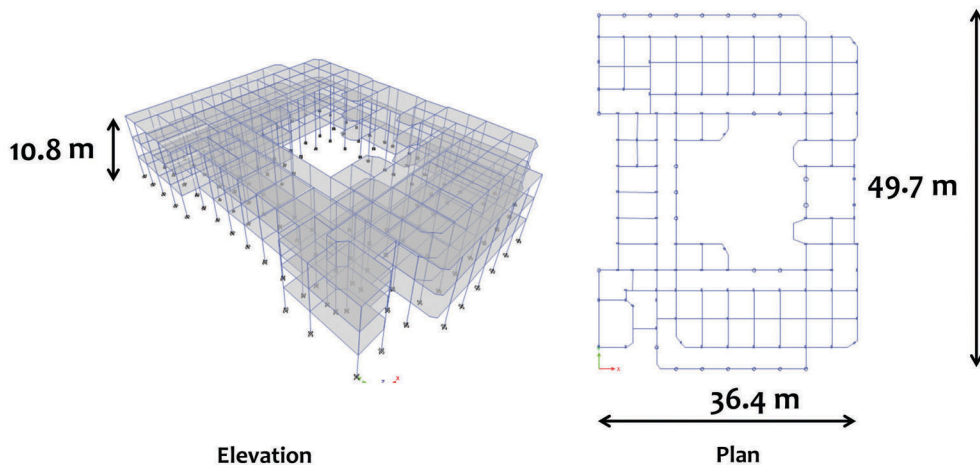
Elevation and plan of analytical model of Block II, Nilgiri Building, IIIT-Hyderabad.
